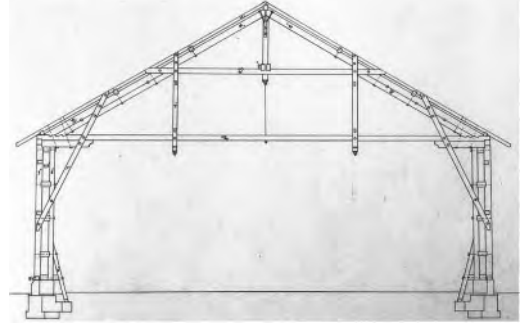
Historical plan of the principal roof truss in Winterthur (Winterthur City Archive, STAW plan H 246).
